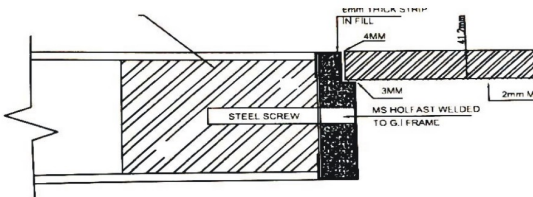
Top view of right section showing fixing details of frame and leaf of door set (Specimen - 1)
